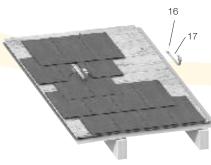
Fixing Mounting Battens and Roof Anchors through Sarking
